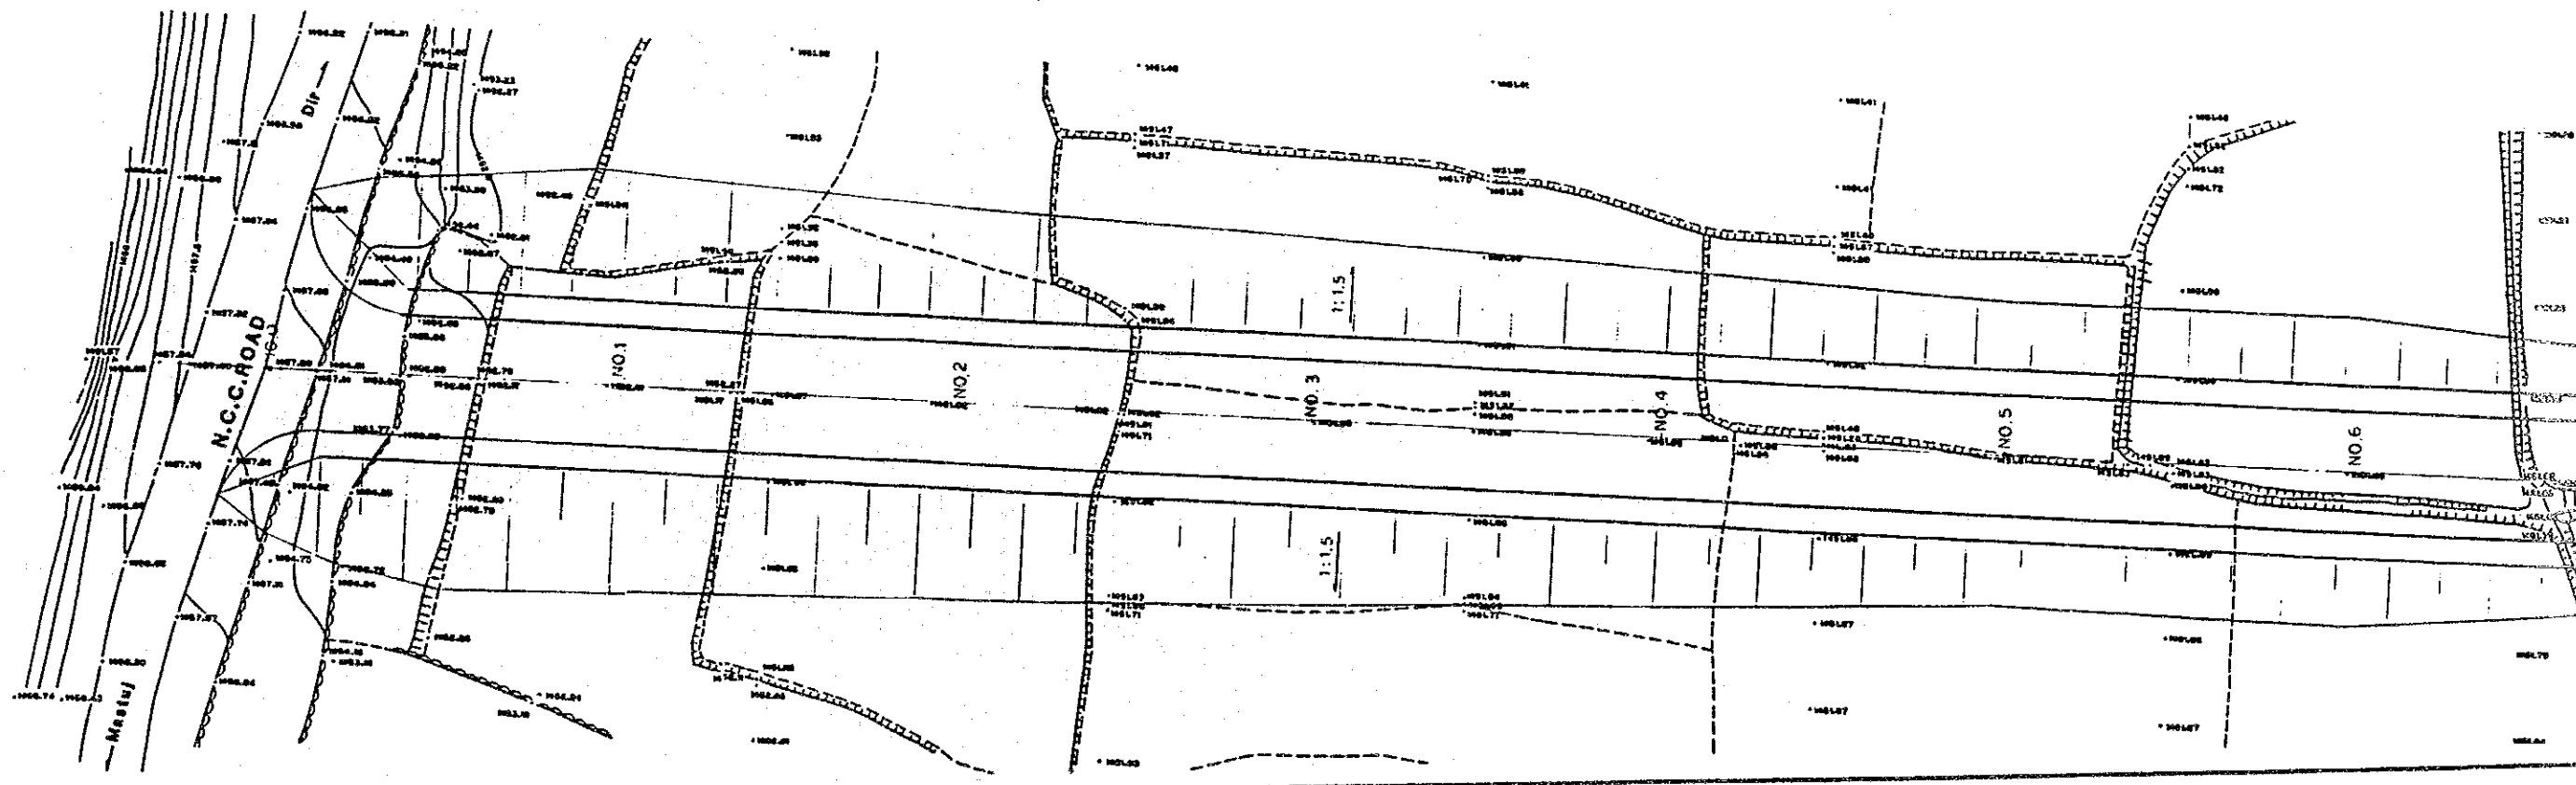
General Layout Plan of the No.7 Panipa Bridge
